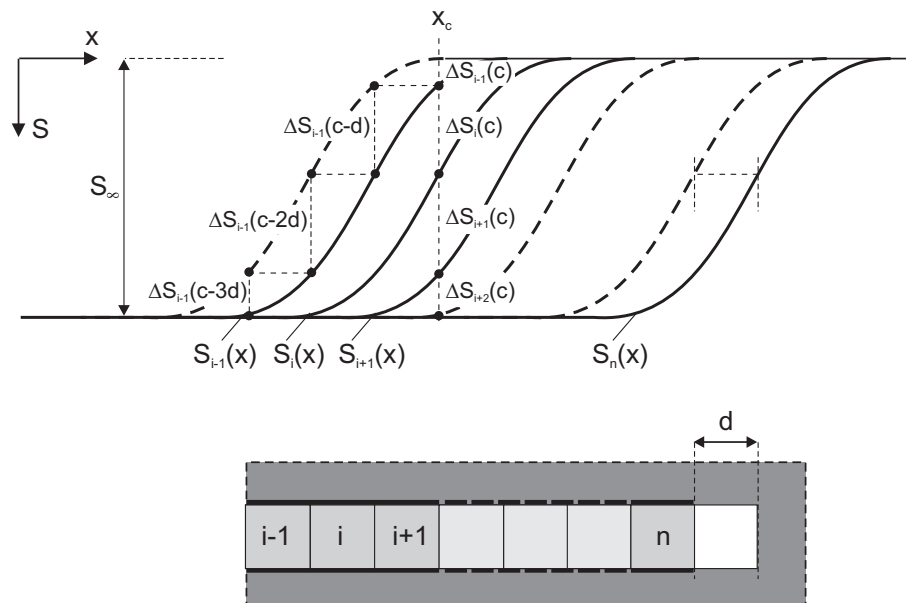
Longitudinal settlement curve above advancing tunnel excavation
